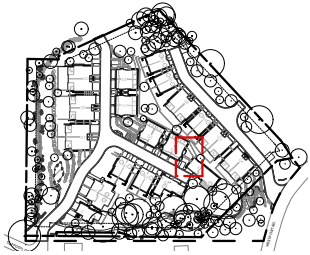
DETAIL PLAN: INTERNAL ROAD FEATURE NODE PLANTING CONCEPT
